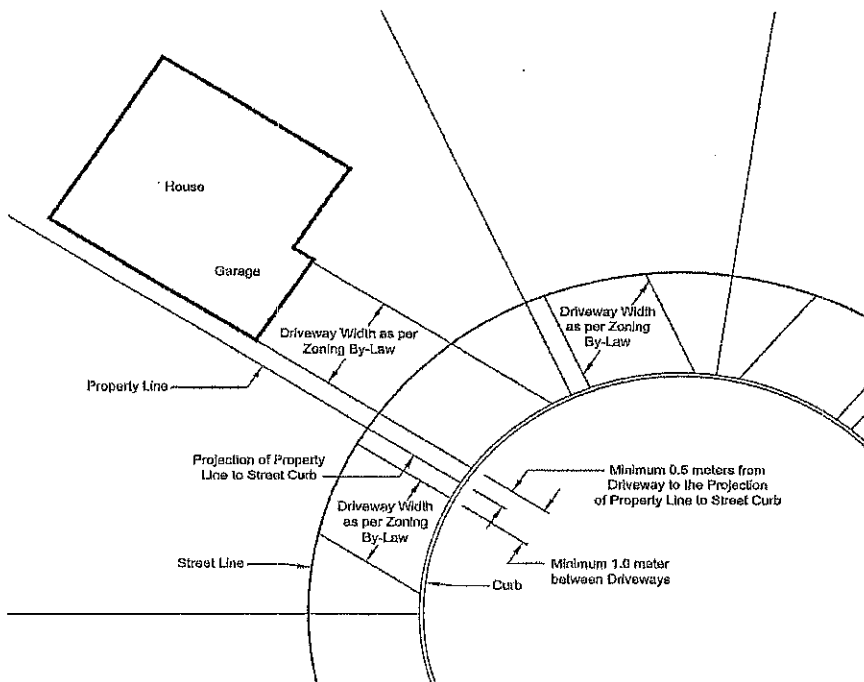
Minimum spacing between driveways at the Street Curb – Curve or Angle Bend in the Street
